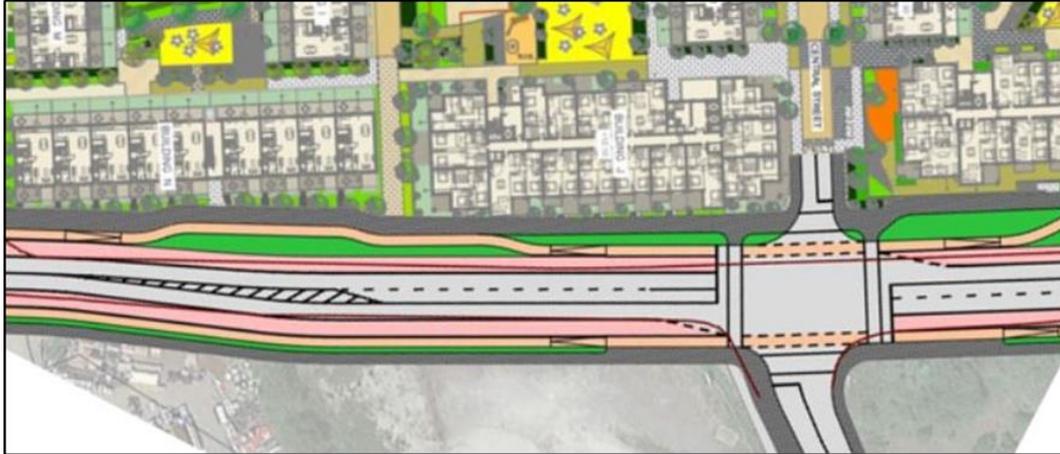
Section of Kinsale Road south of Mick Barry Road and Kinsale Road / Mick Barry Road Junction (Future Road Network)
